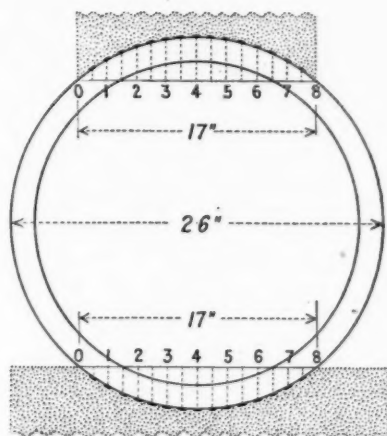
Position of $\frac{5}{16}$ -in. Steel Strips for Measuring the Distribution of Pressure at the Top and Bottom Sand Bearings. The Strips Are Equally Spaced with Reference to the 17-in. Chord.
